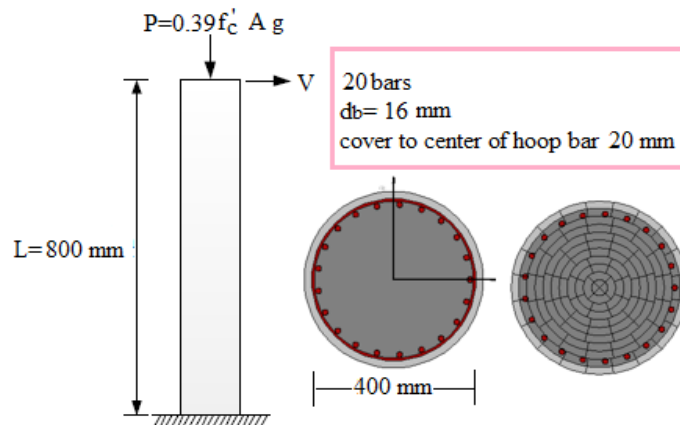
Reinforced concrete column with softening behavior (Wong et al. 1993, Specimen No. 3).
